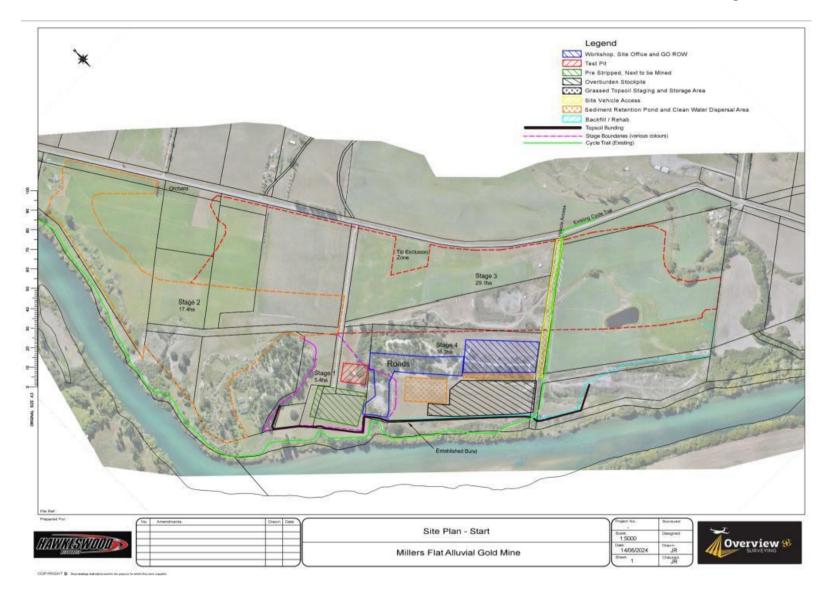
Site Plan (Source: Master Plan Set, 24/06/2024)
